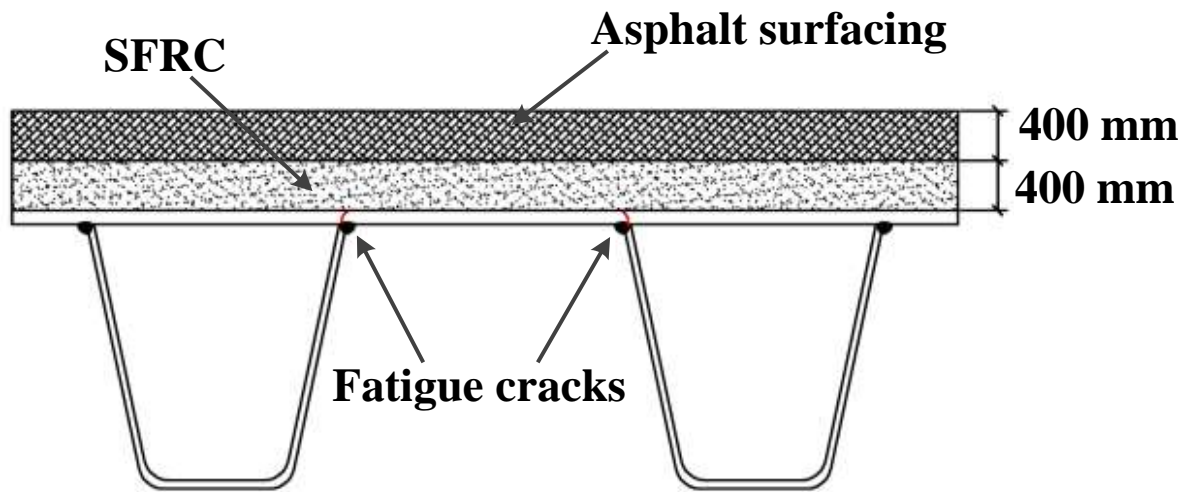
Steel fiber reinforced concrete (SFRC)
